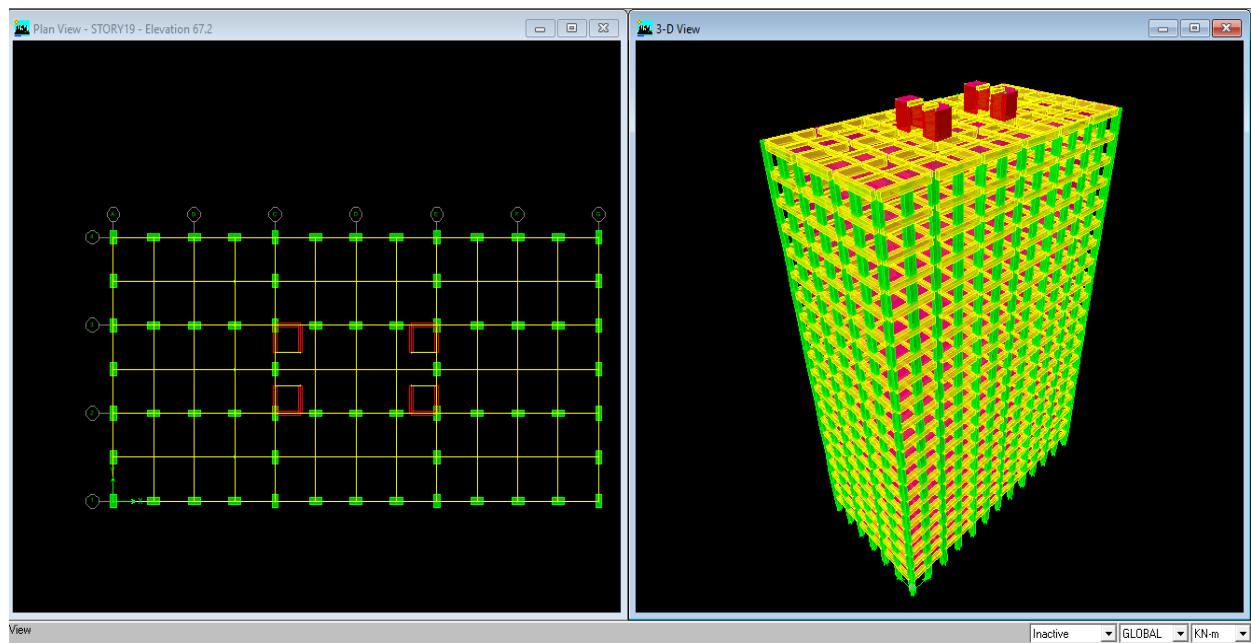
Plan view and 3-D view of 20 storied Bundled Tube structure building
